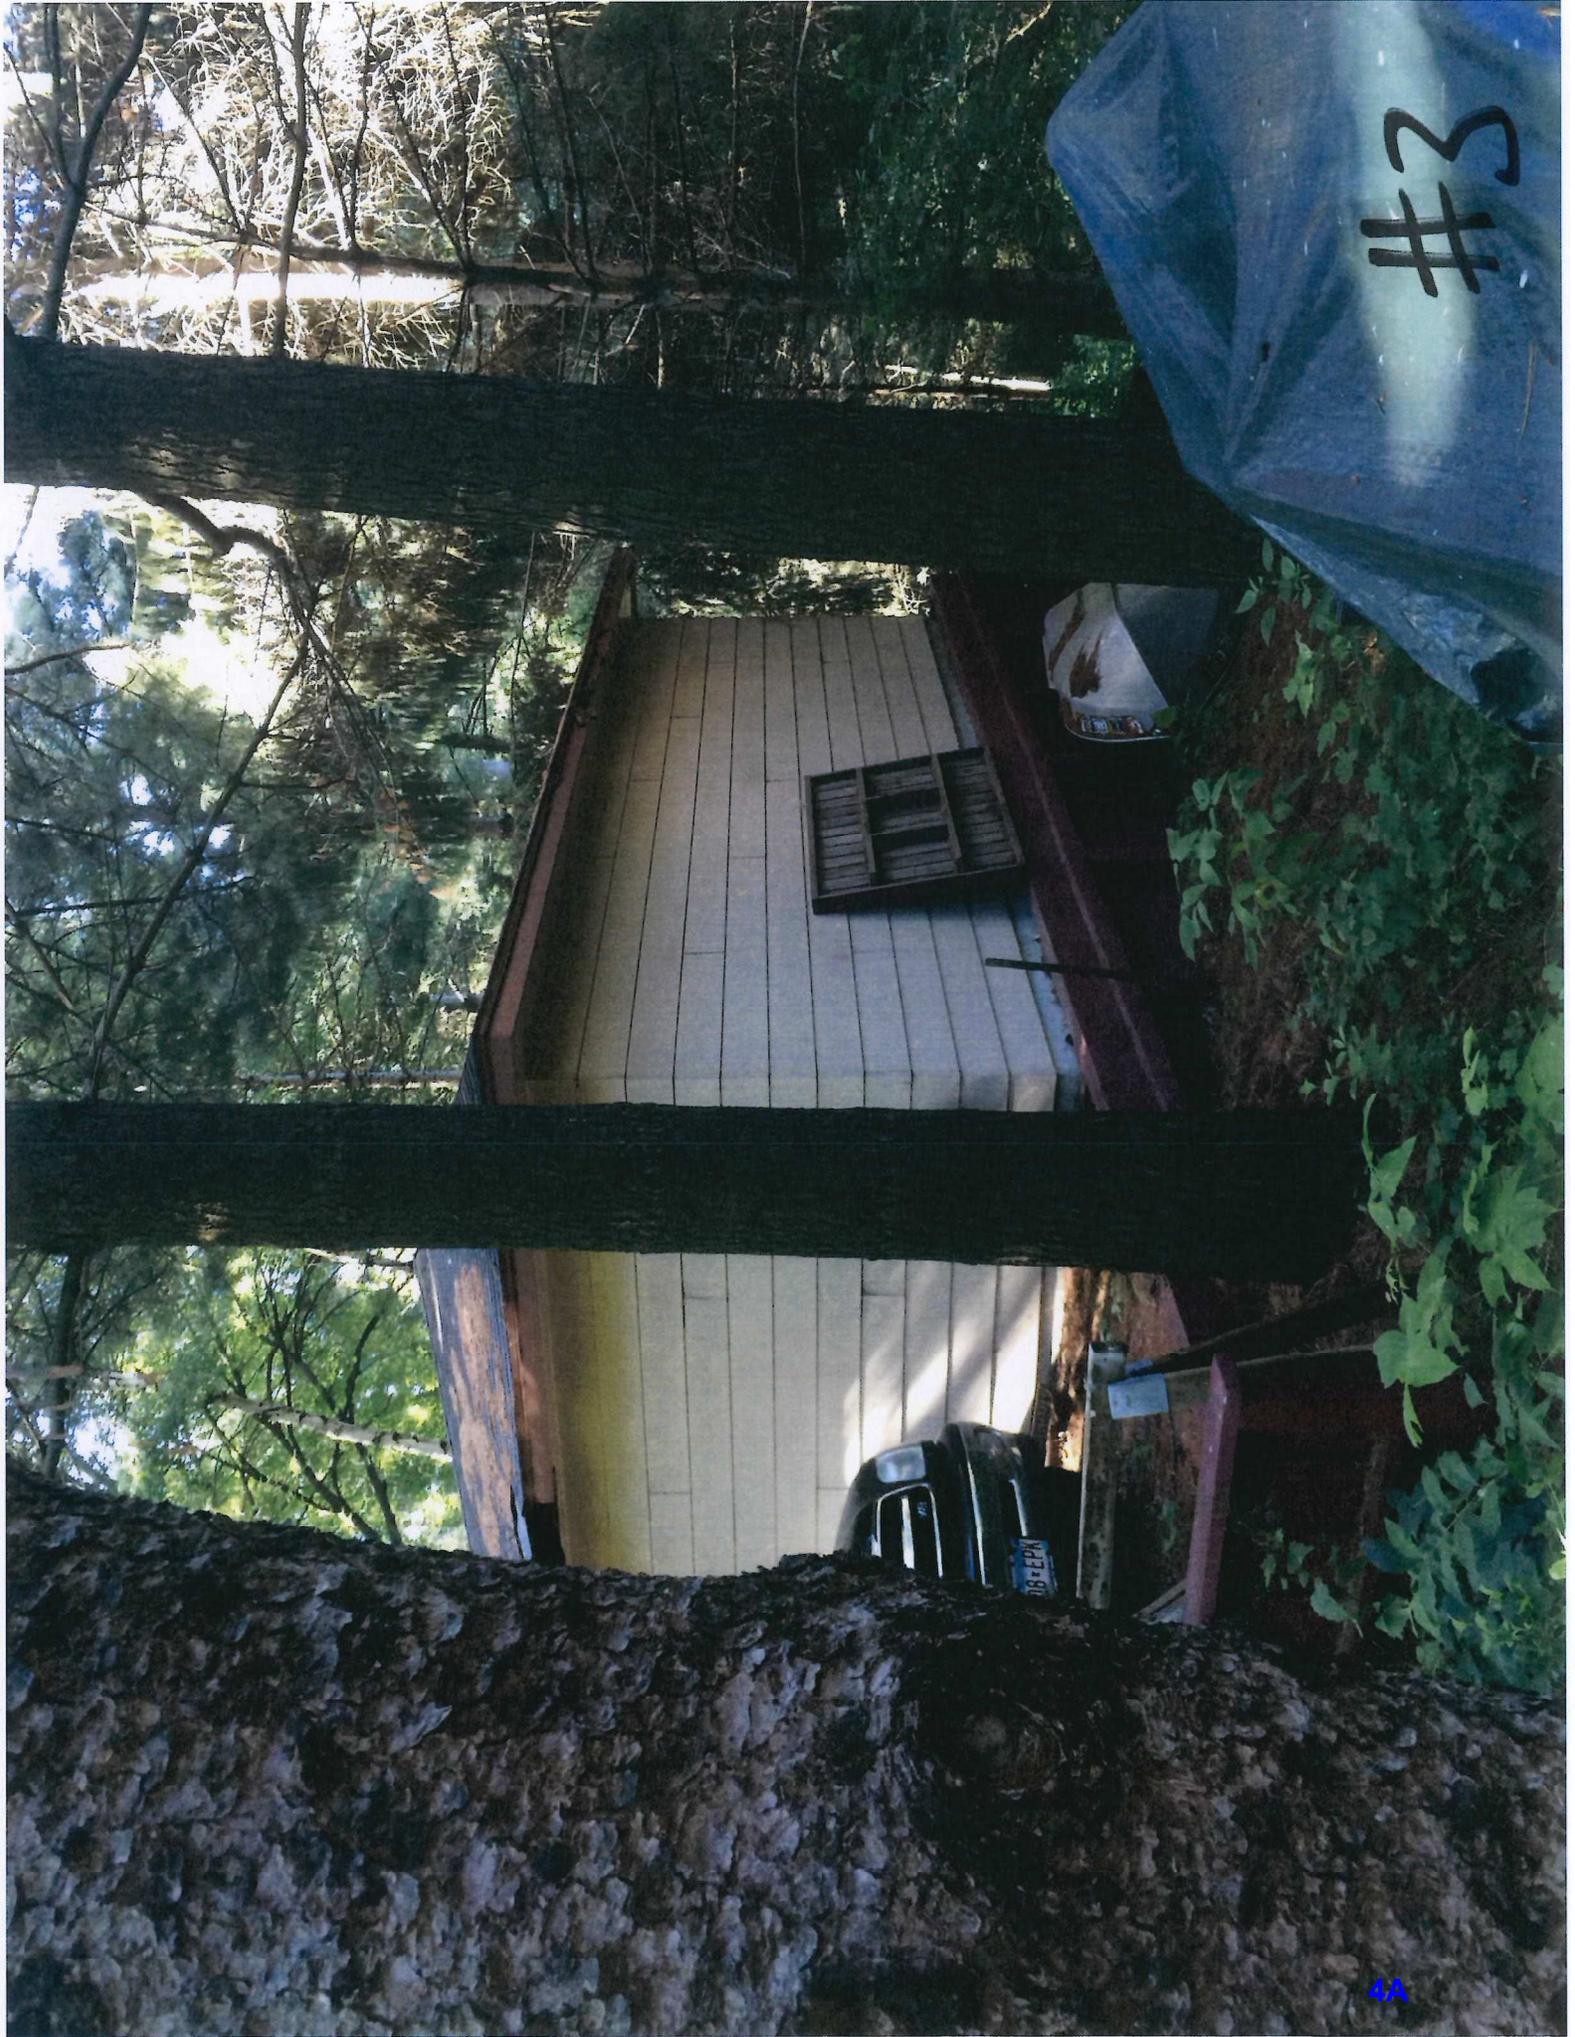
shows a better view of the privacy fence. It is believed the essential character of the property will not be altered because the new garage structure will largely encompass an area used as a parking spot currently, and the whole structure is situated away from the house.
